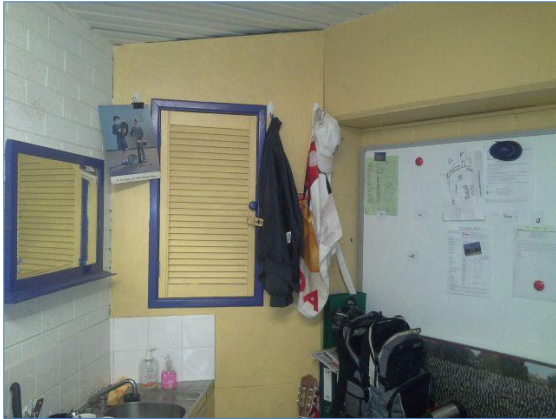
Room 3.3 Store – Fibre cement north wall lining and infill panels behind flammable cupboard
